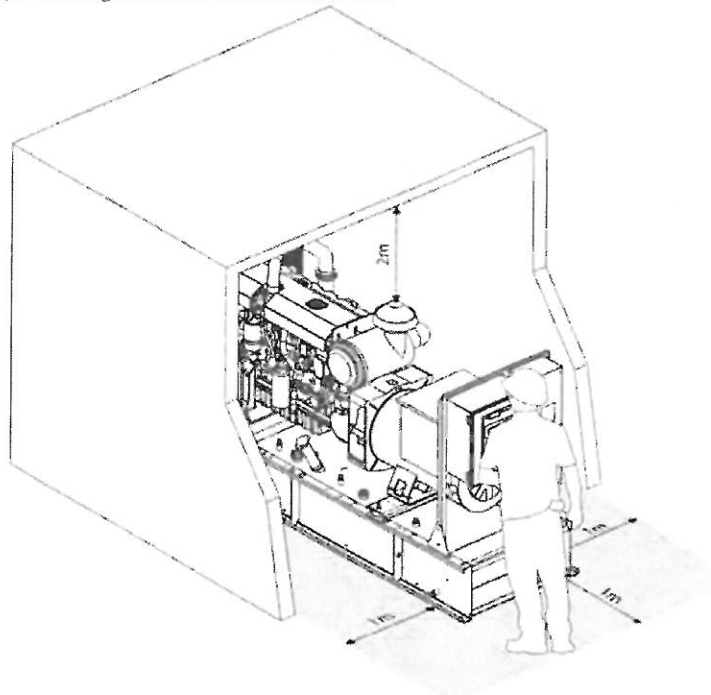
Typical Installation showing generating set access and Operator Workstation
